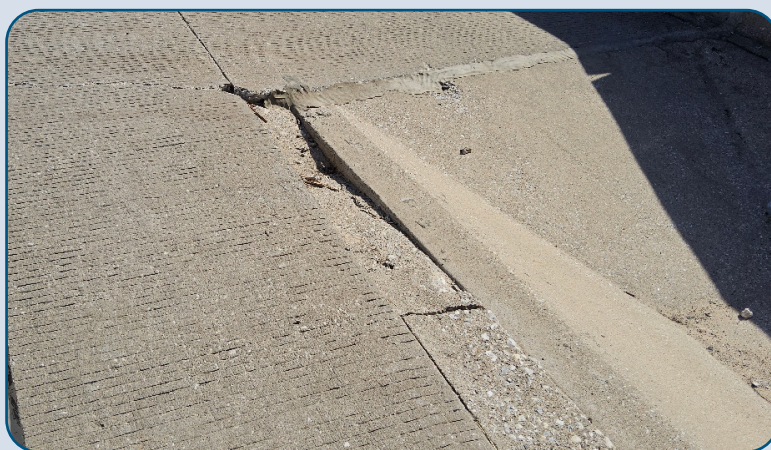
LLTB Concrete Pavement Spalling.
